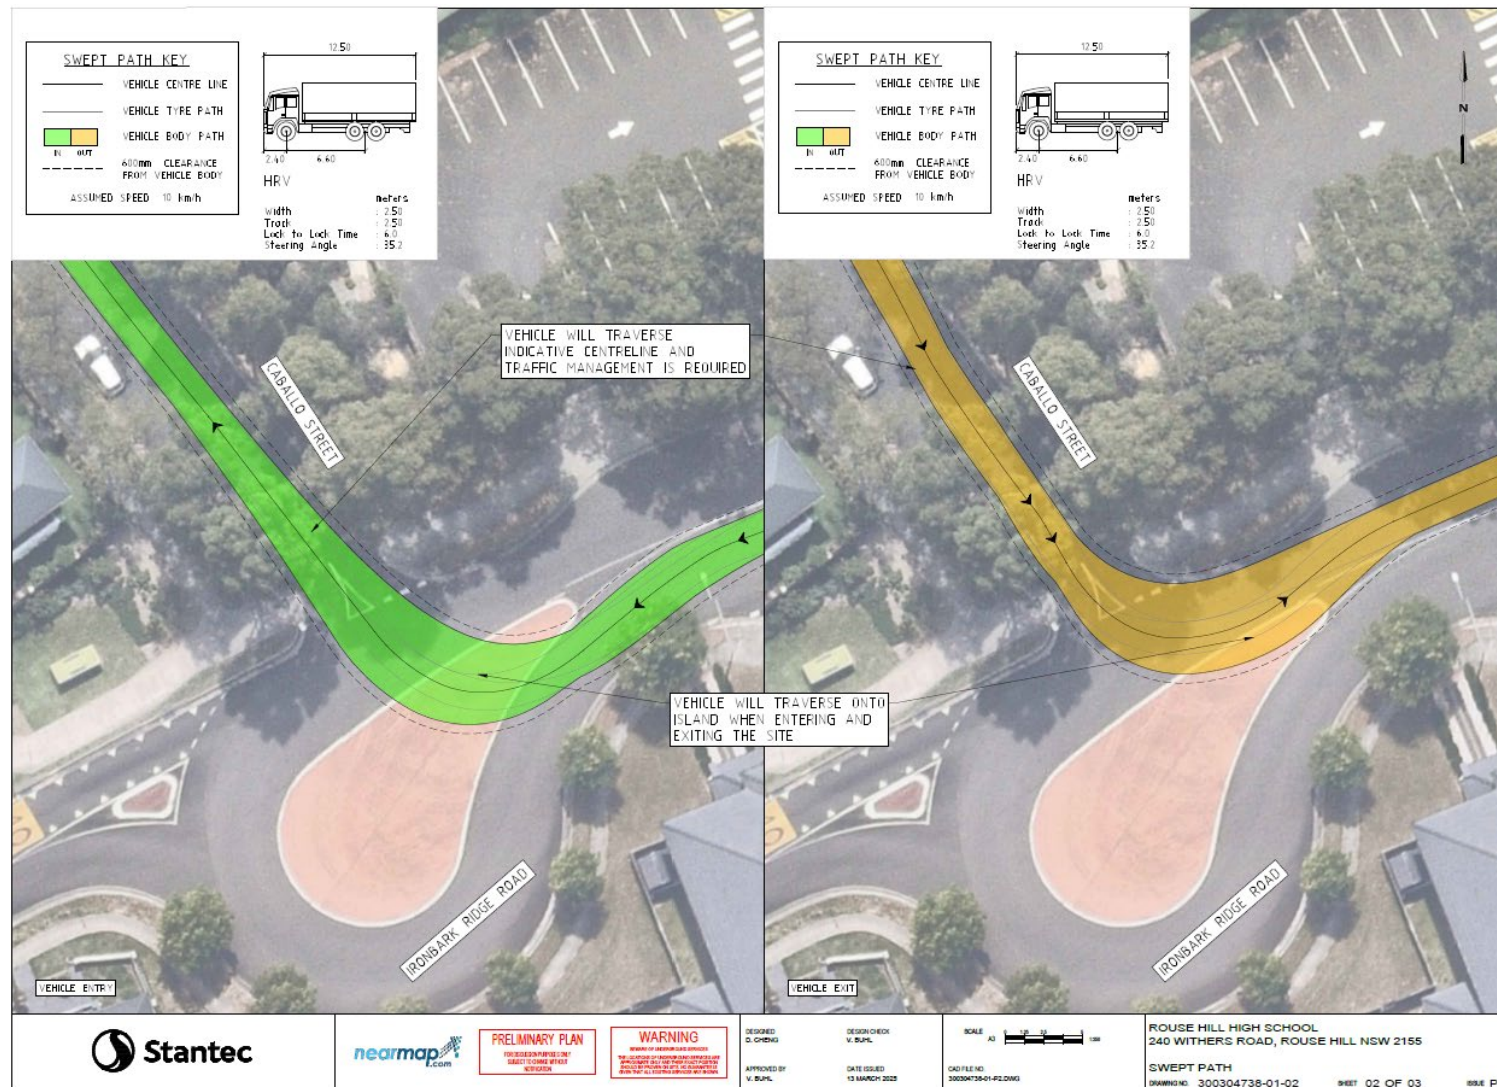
Construction heavy vehicle swept paths at Ironbark Ridge Road intersections with Caballo Street (east)
